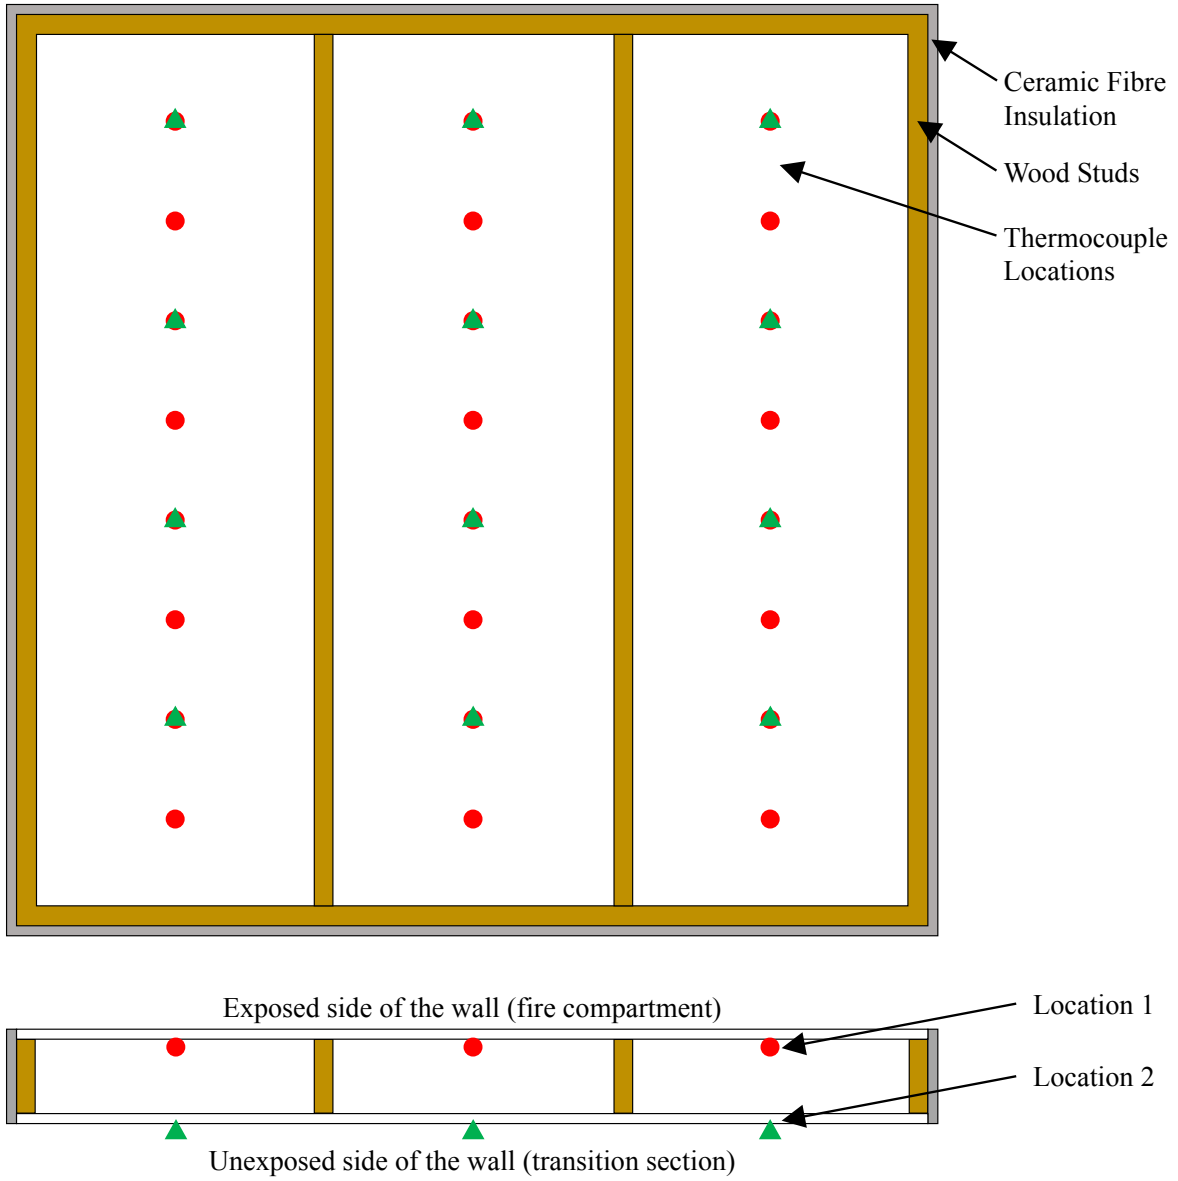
Thermocouple locations on a test wall with 24 in (609 mm) stud spacing.
